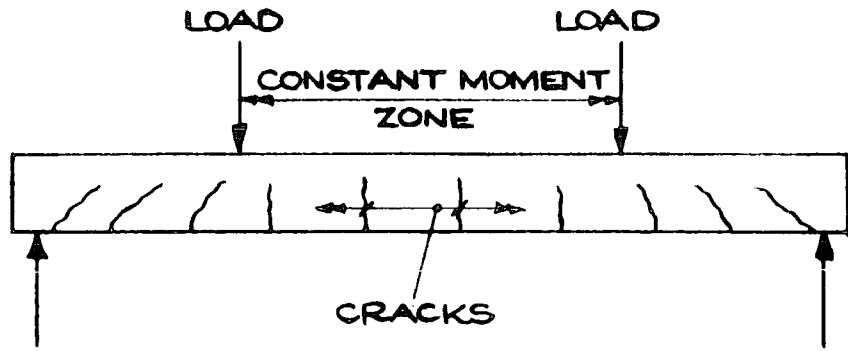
TYPICAL CRACK PATTERN FOR A REINFORCED CONCRETE BEAM
